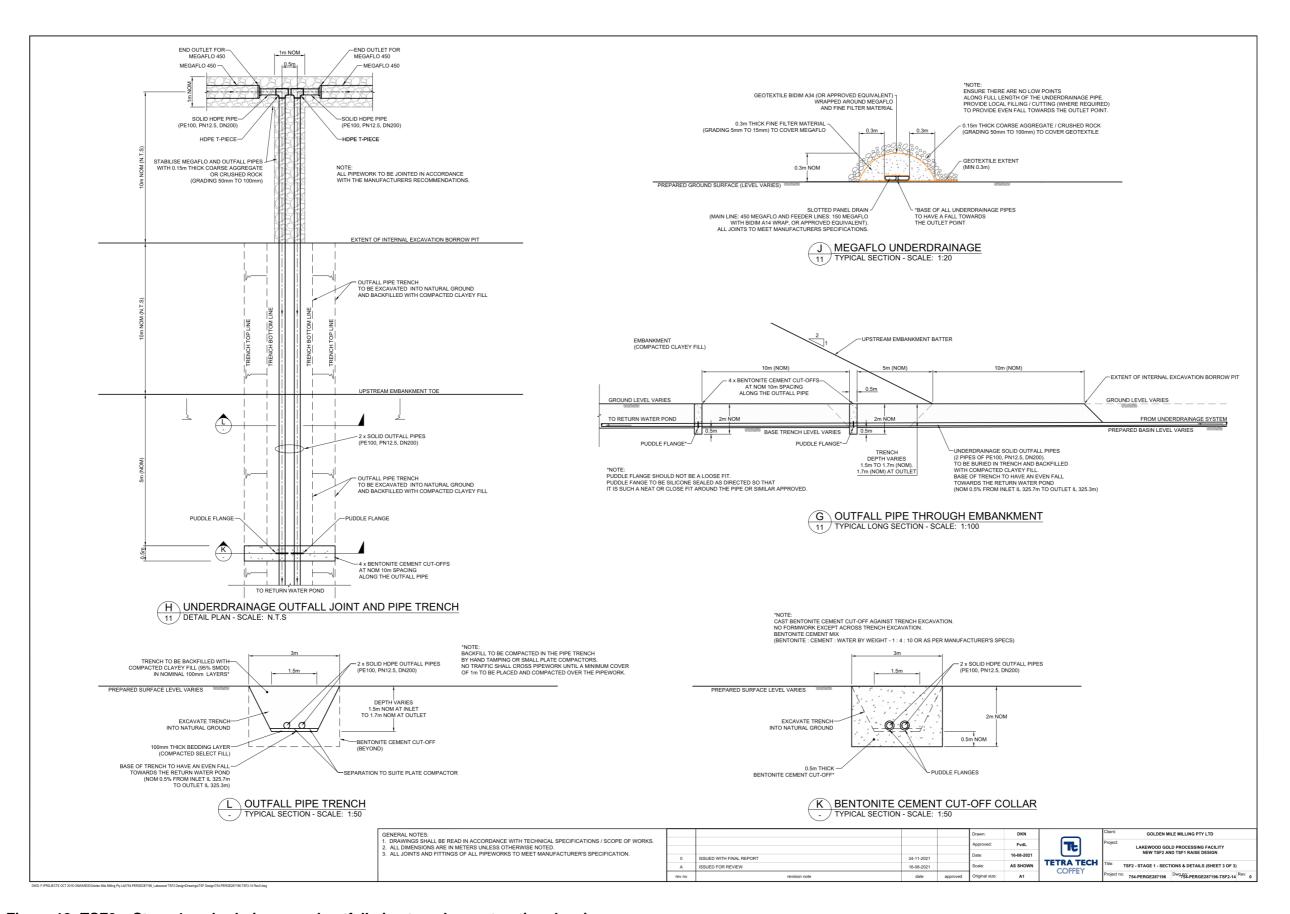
TSF2 – Stage 1 underdrainage and outfall pipe trench construction drawings
